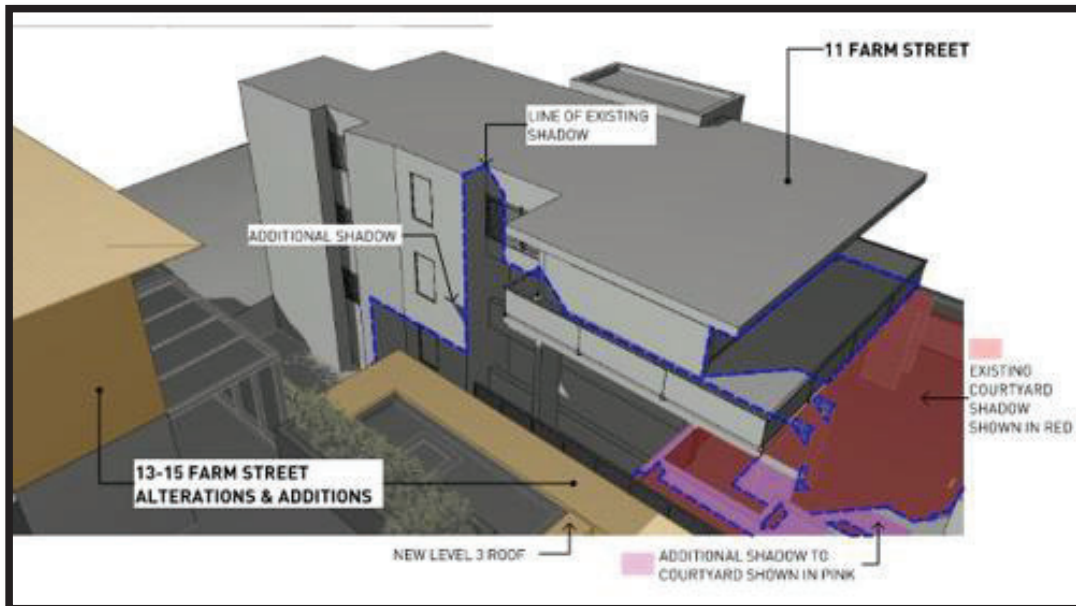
Additional overshadowing onto 11 Farm Street at 1pm.
